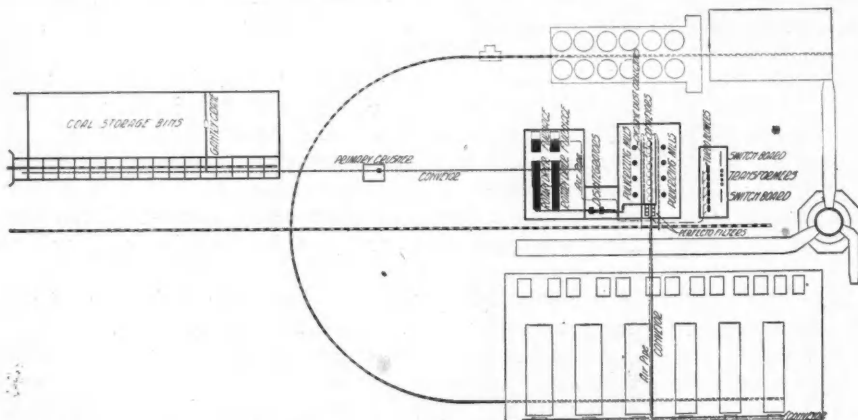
GENERAL PLAN OF COAL-PULVERIZING PLANT
